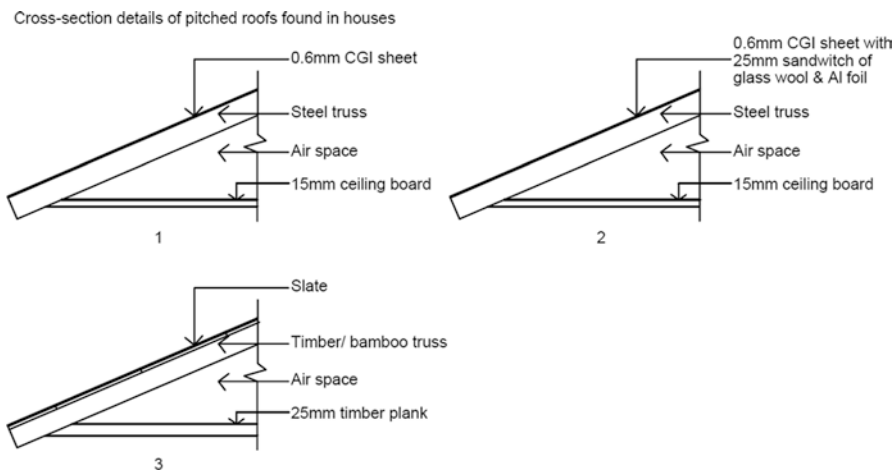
Details of pitched roofs found in houses at Hamirpur (HP)
